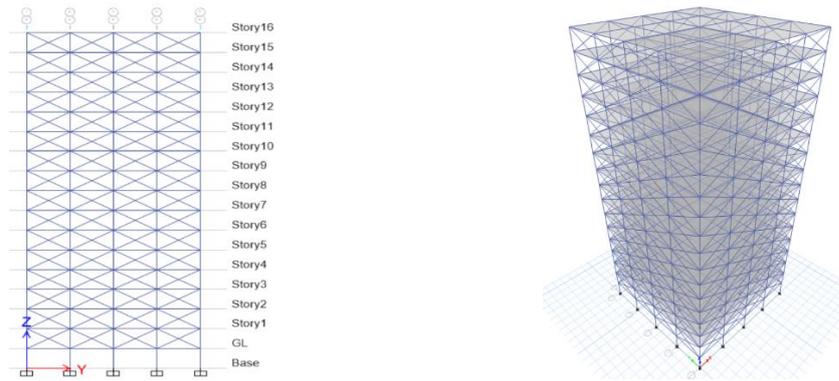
Plan for Bare Frame and Braced Frame Building
